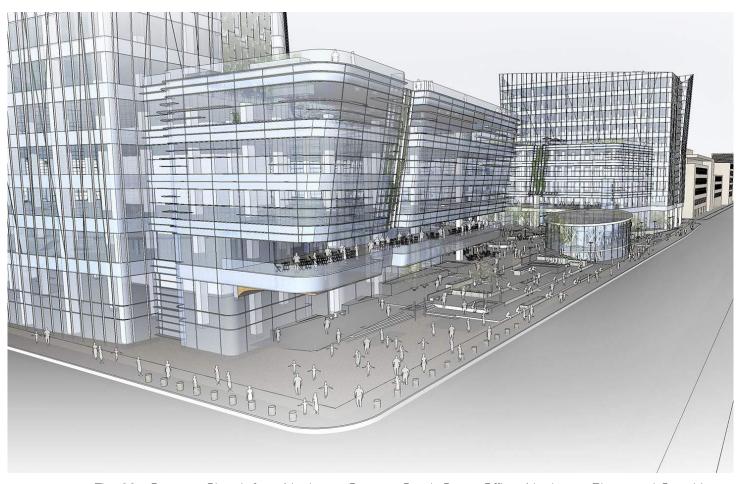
Concept Sketch from Northeast Corner - South Street Office, Northwest Plaza, and Gate House
